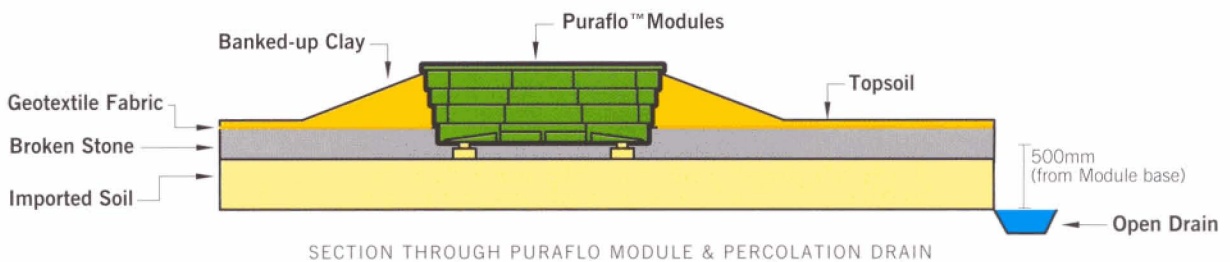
Disposal for Site with Poor Percolating Soil and Receiving Water. (Drawing not to scale)
